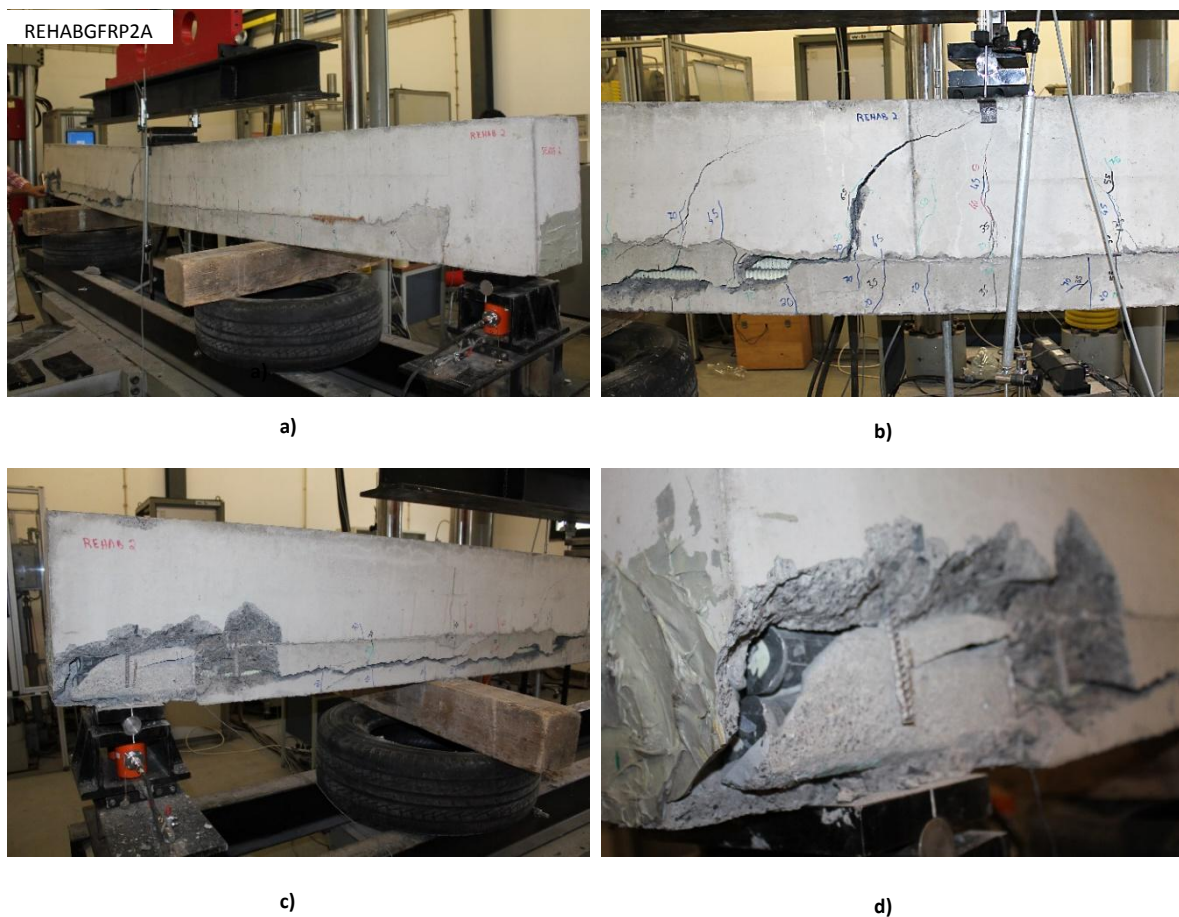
REHABGFRP2A: a) general view b) mid-span detail; c) support detail; d) reinforcement slip detail
